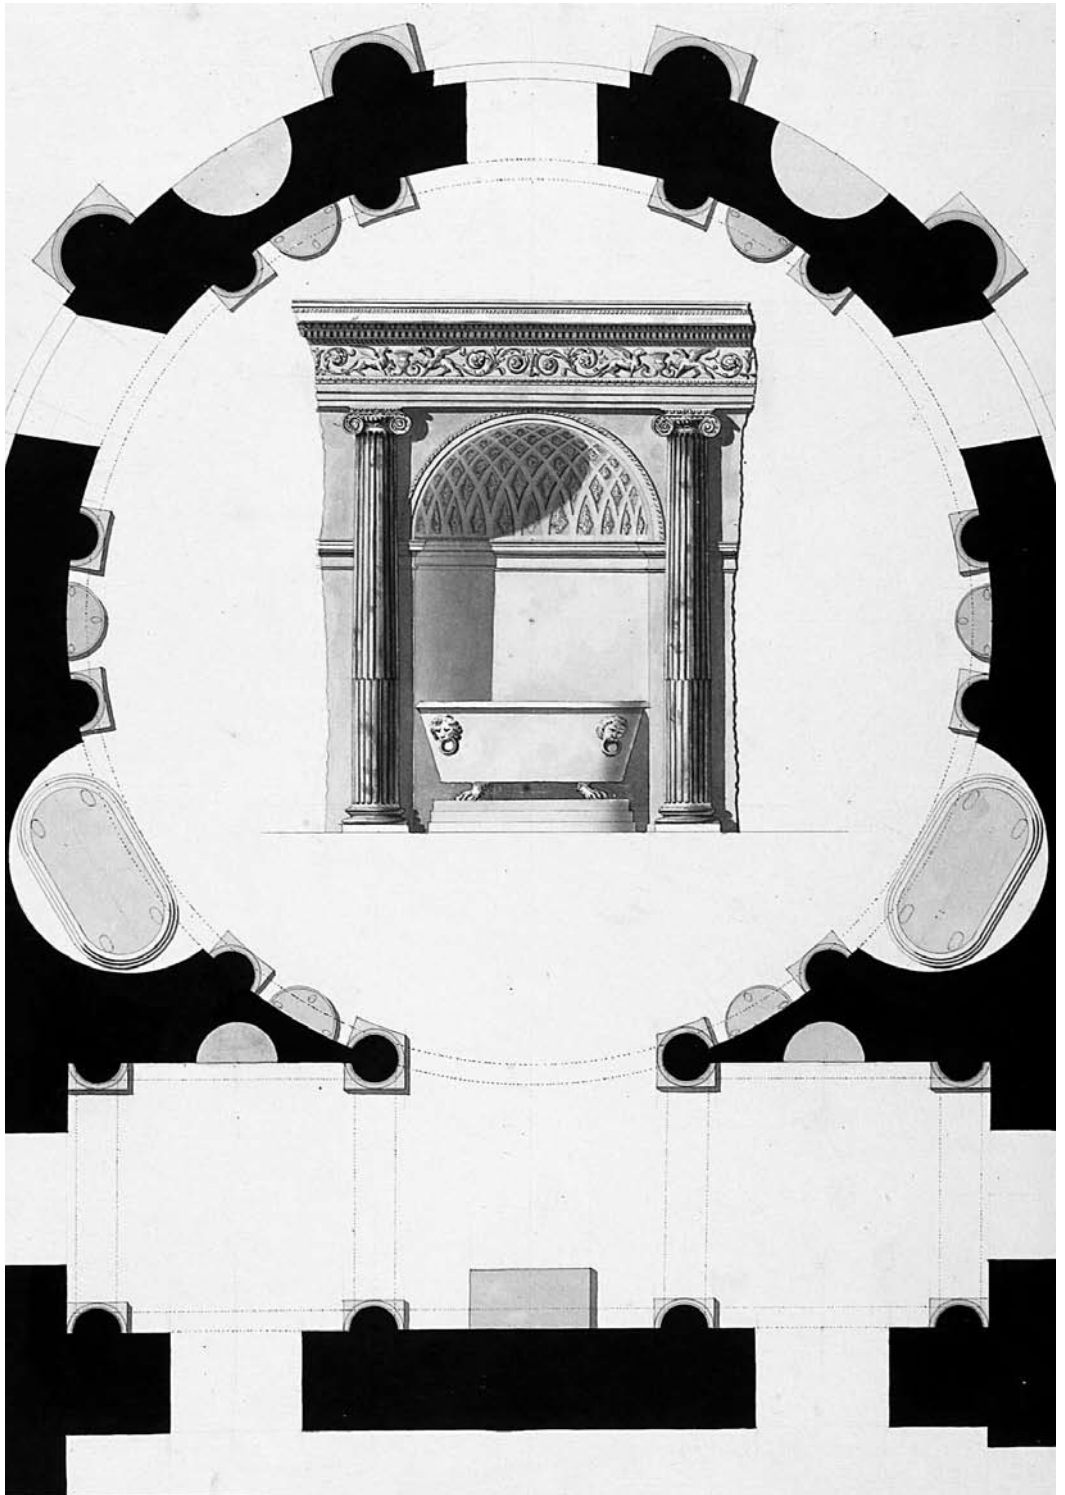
Ground plan and elevation detail of the unctorium (WAF 67, J. Rys. 5.011)
